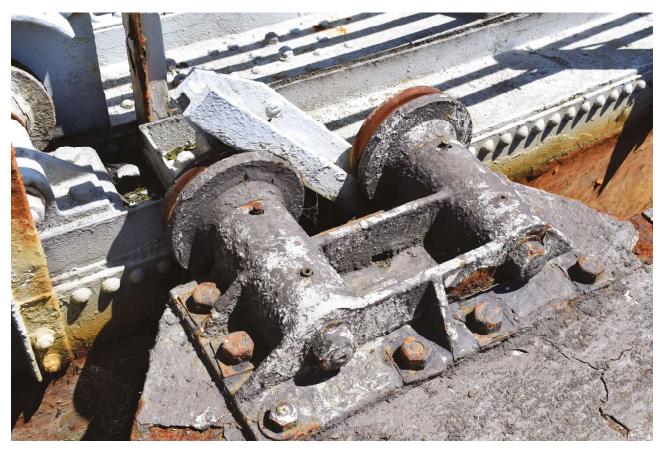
Park Road, Worthing, detail of guided rollers from the north-west
